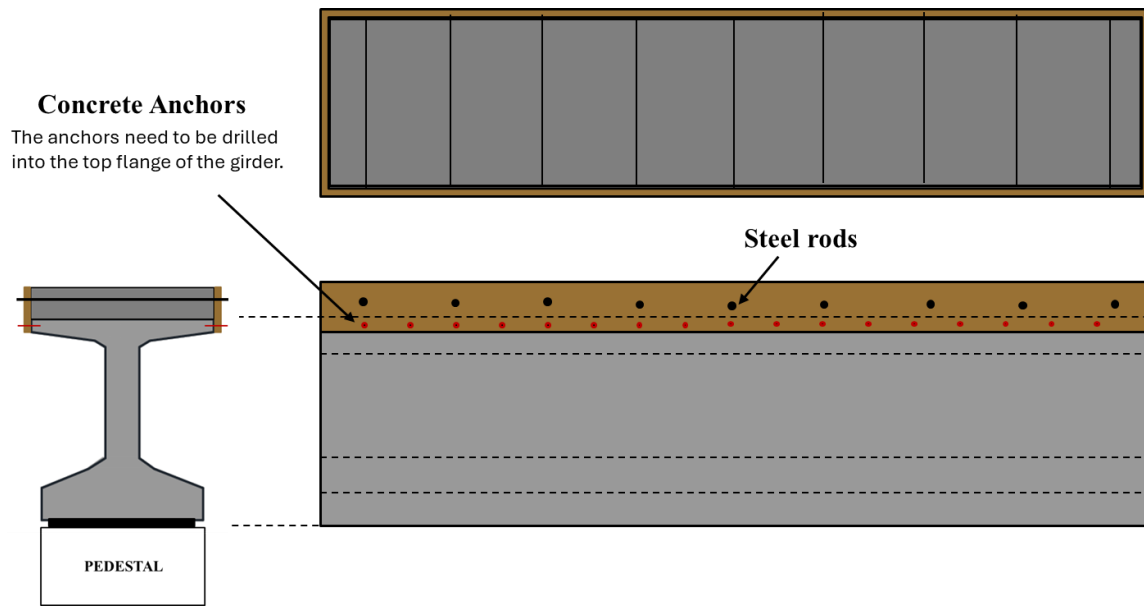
Cross section of Girder G1\* with the deck.
